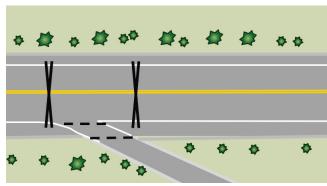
Unmarked Crosswalk Connecting Curb Ramp and Shoulder across a Diverging Ramp
